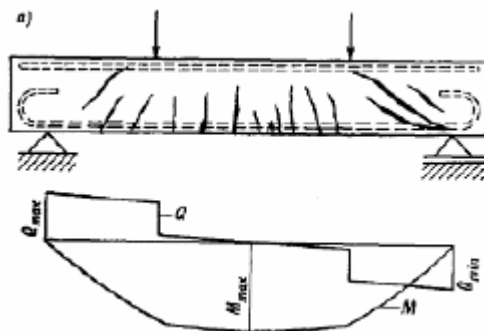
Bending behaviour of steel reinforced concrete ^[11]
